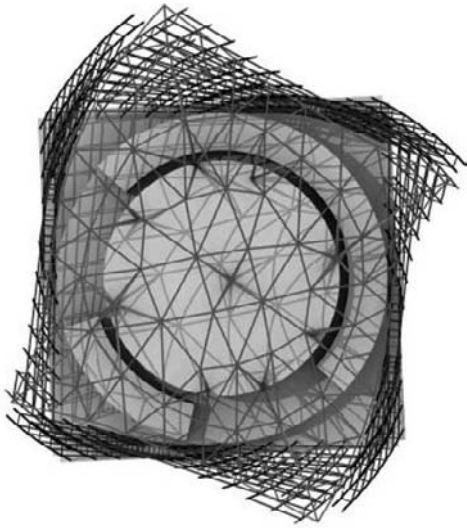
The twisted roof structure at the top of the building is designed with steel 'branches' in the manner of a tree. Architect: RMJM
